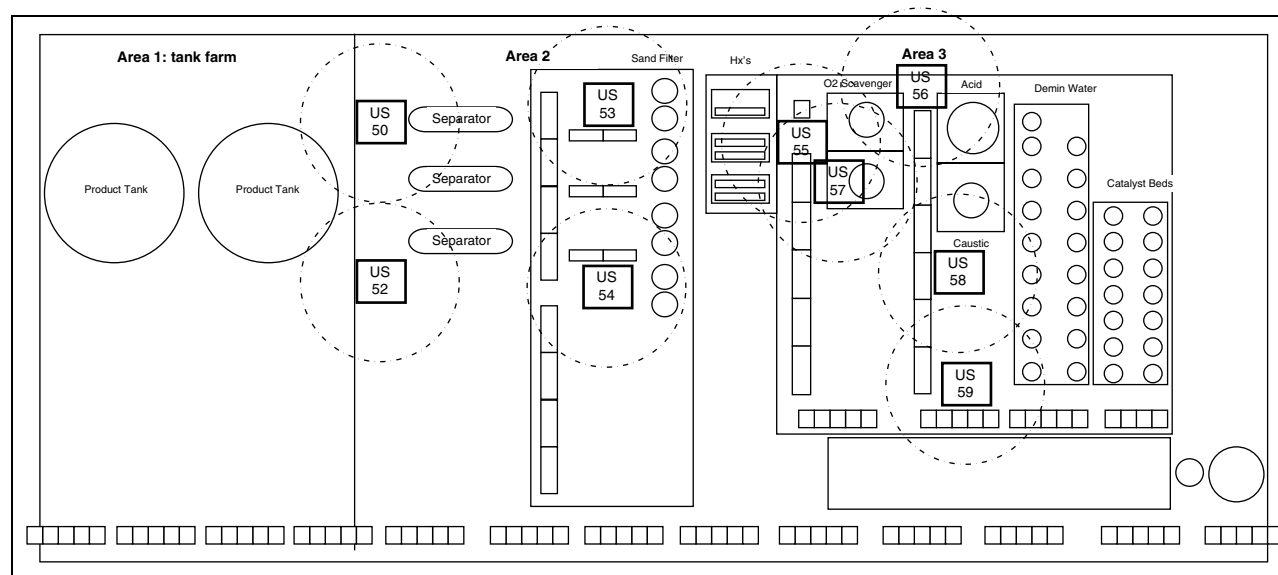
Positioning of utility stations in a plant based on the plot plan.
